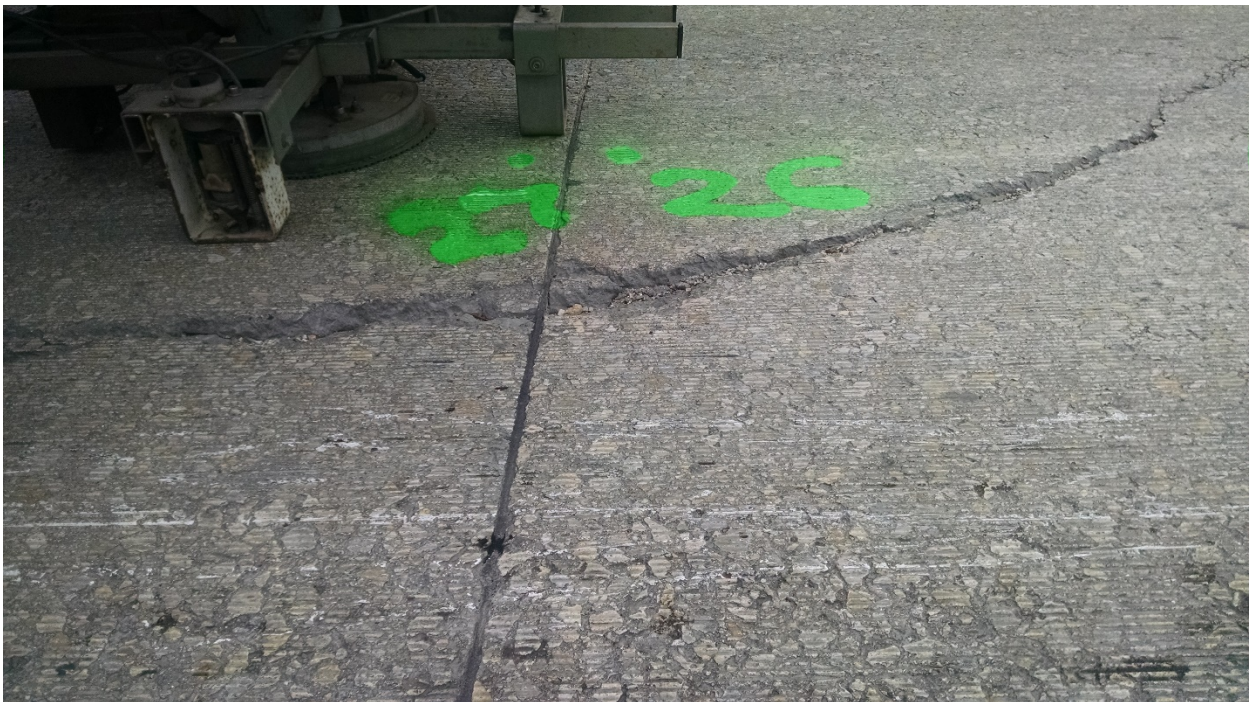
Solms Rd. Slab Heave and Failure/Crack Tested.
